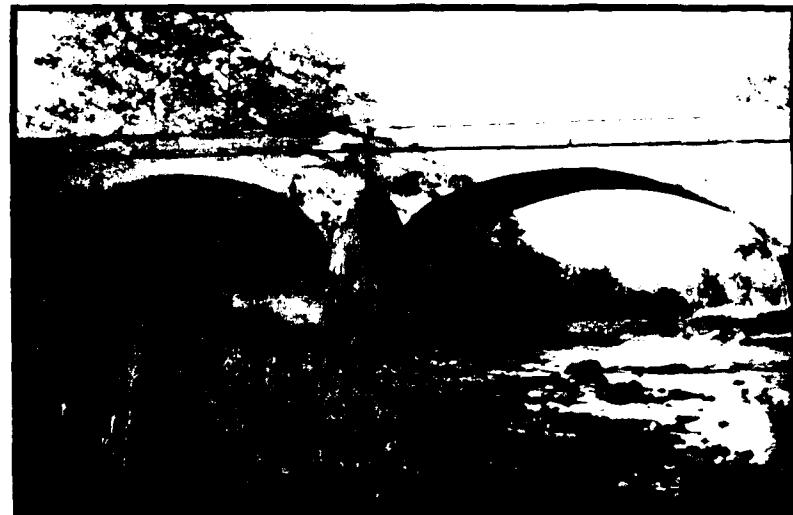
Looking downstream at Mill Road bridge at mile 6.1. A large shoal area has built up here blocking almost the entire width of the bridge opening.
